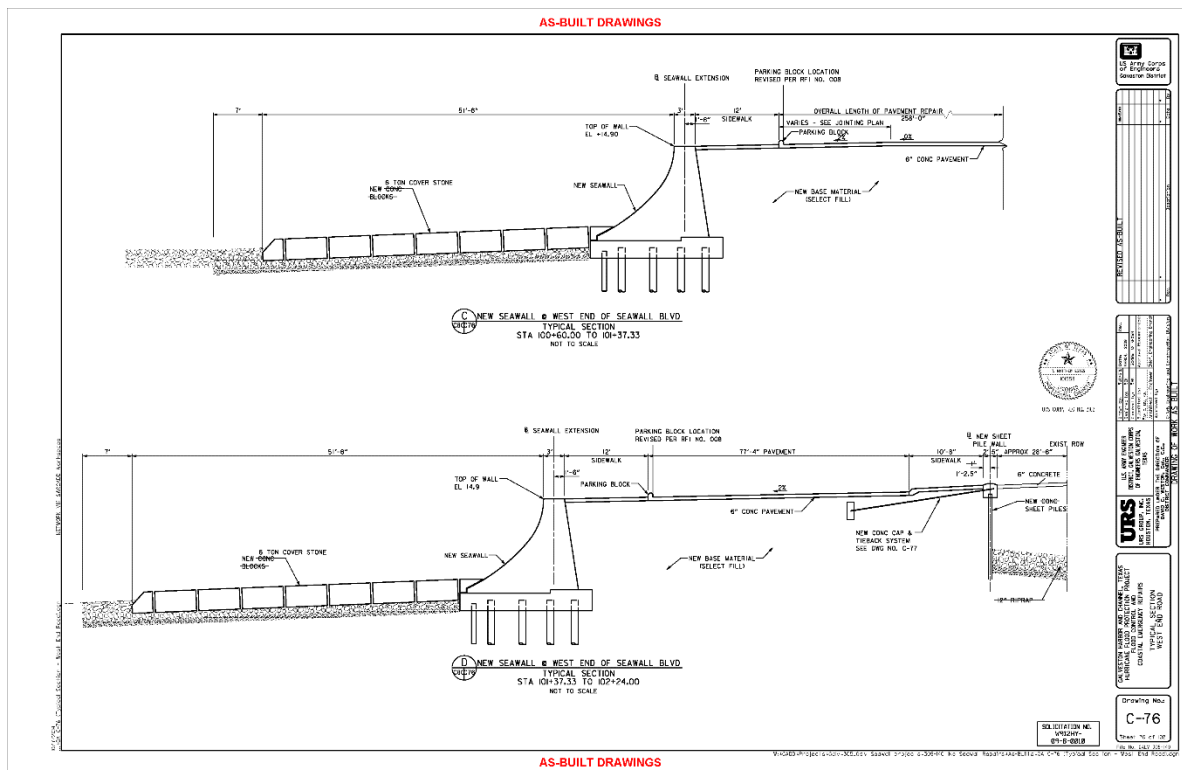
XS of new seawall construction on West End per March 2009 As-Built Drawings; Drawing No. C-76 (USACE-SWG 2009)
